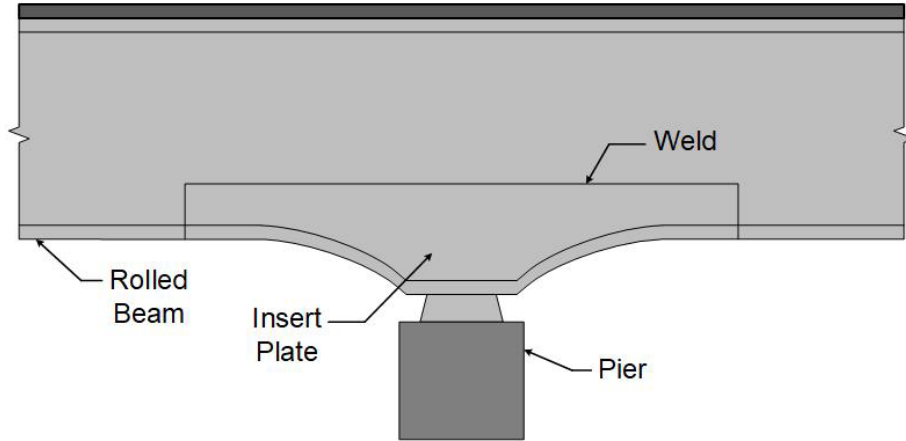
Web Insert Plate for Rolled Beam Bridge
